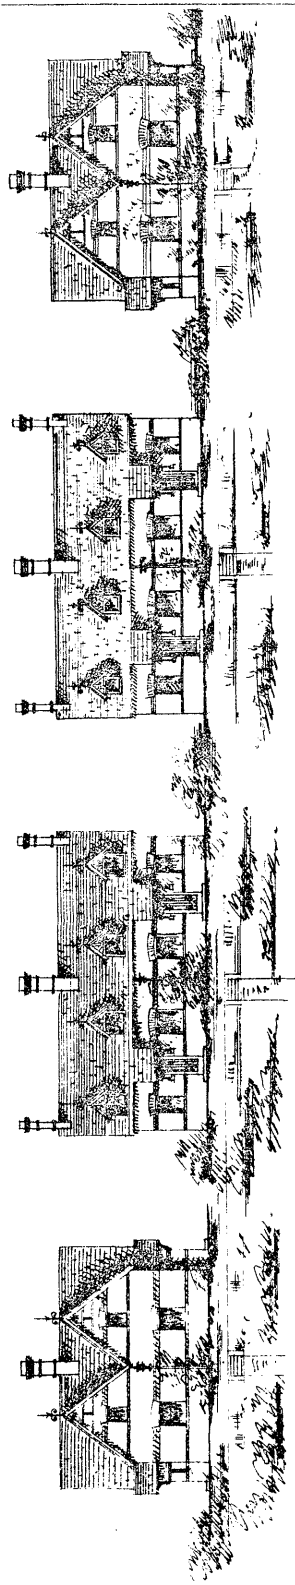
PLATE IV.—*This Drawing shows, on a small scale, a Group of Cottages recently erected on a site adjoining the Railway Station, at Great Bedwyn, near Marlborough, Wilts, for THE MOST NOBLE THE MARQUIS OF AILESBUURY, K.G.
